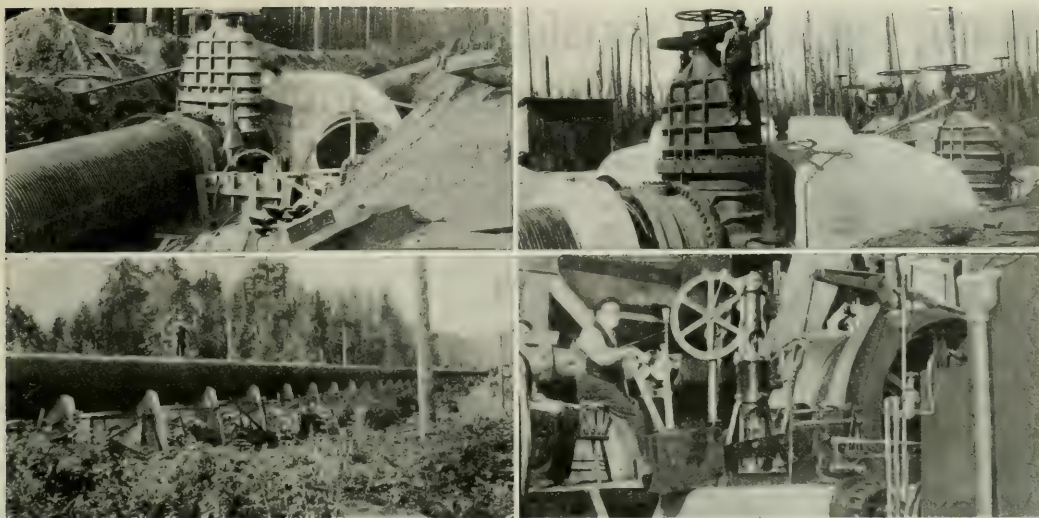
(upper left) 6 ft. wood stave pipe to concrete Y with gate valve. Fig. 6—(upper right) 6 ft. stave pipe to Y branch; 4 ft. 6 in. wood stave pipe leaving Y. Fig. 7—(lower left) 6 ft. wood stave pipe showing concrete saddles. Fig. 8—(lower right) Shaft hoist motor, 350 horse power, liquid controller.
